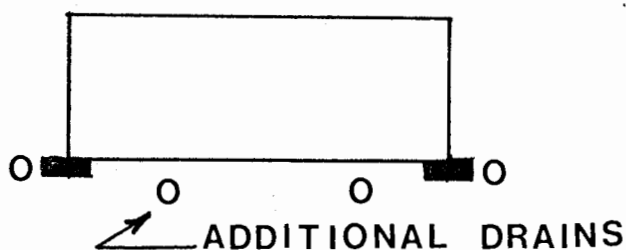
Drainage Techniques (Underground Space Center, 1978, p. 137).
